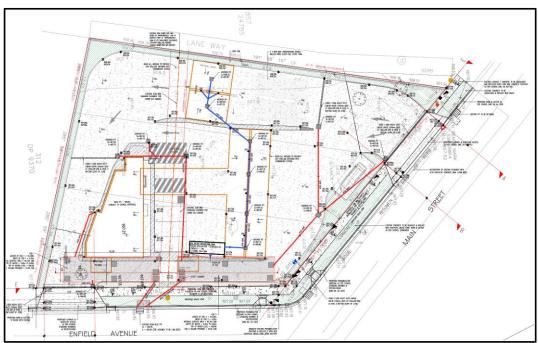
Stormwater Drainage Plan (Source: Neilly Davies, dated 18.12.24)
